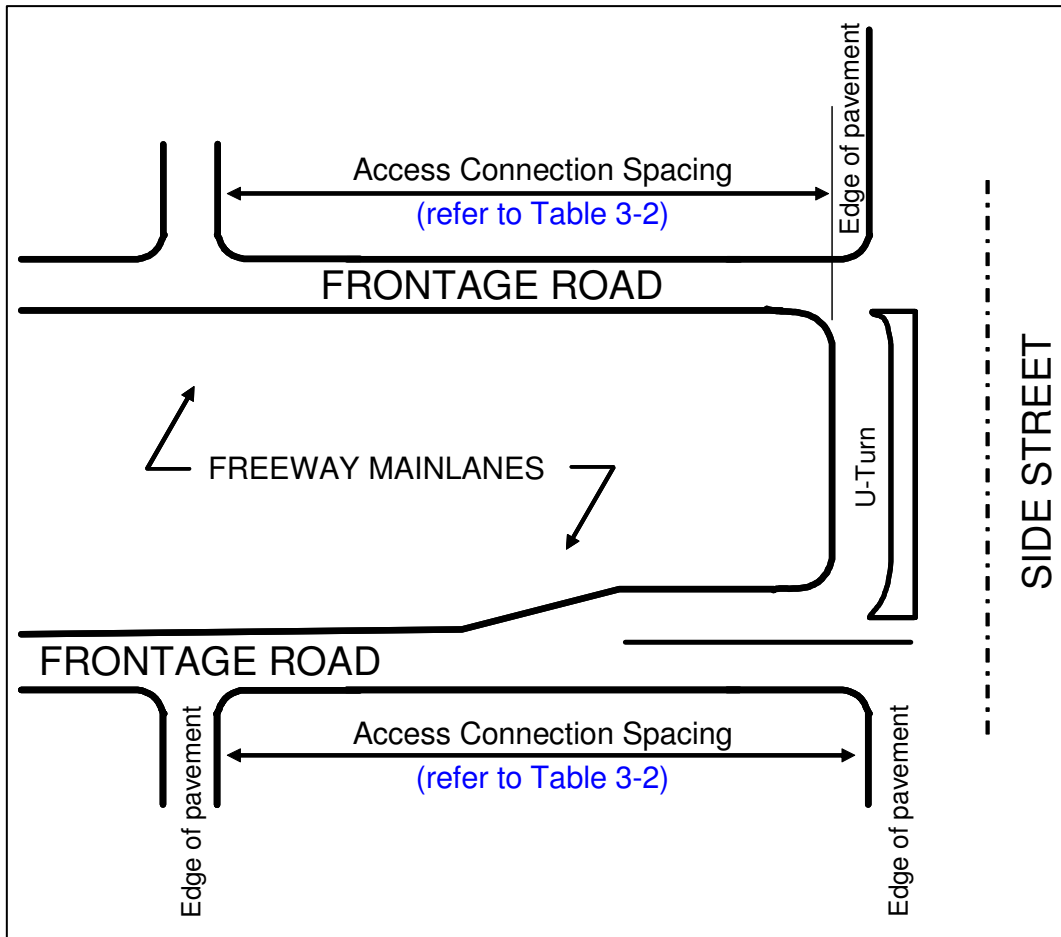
Frontage Road U-Turn Spacing Diagram.
